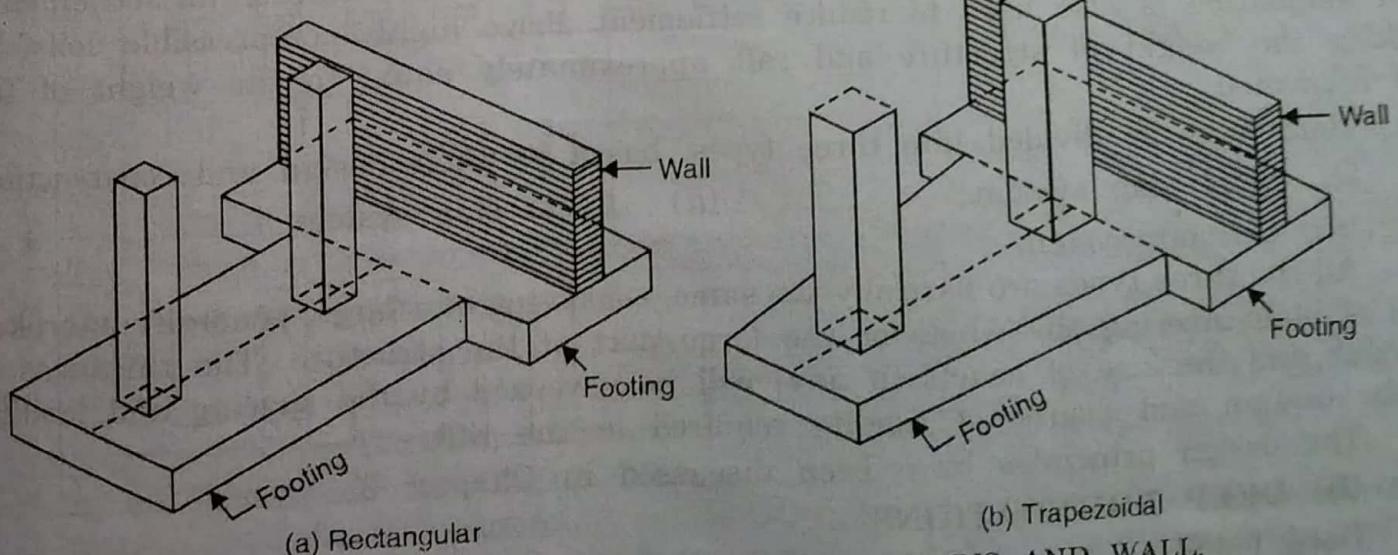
COMBINED FOOTINGS FOR COLUMNS AND WALL.
